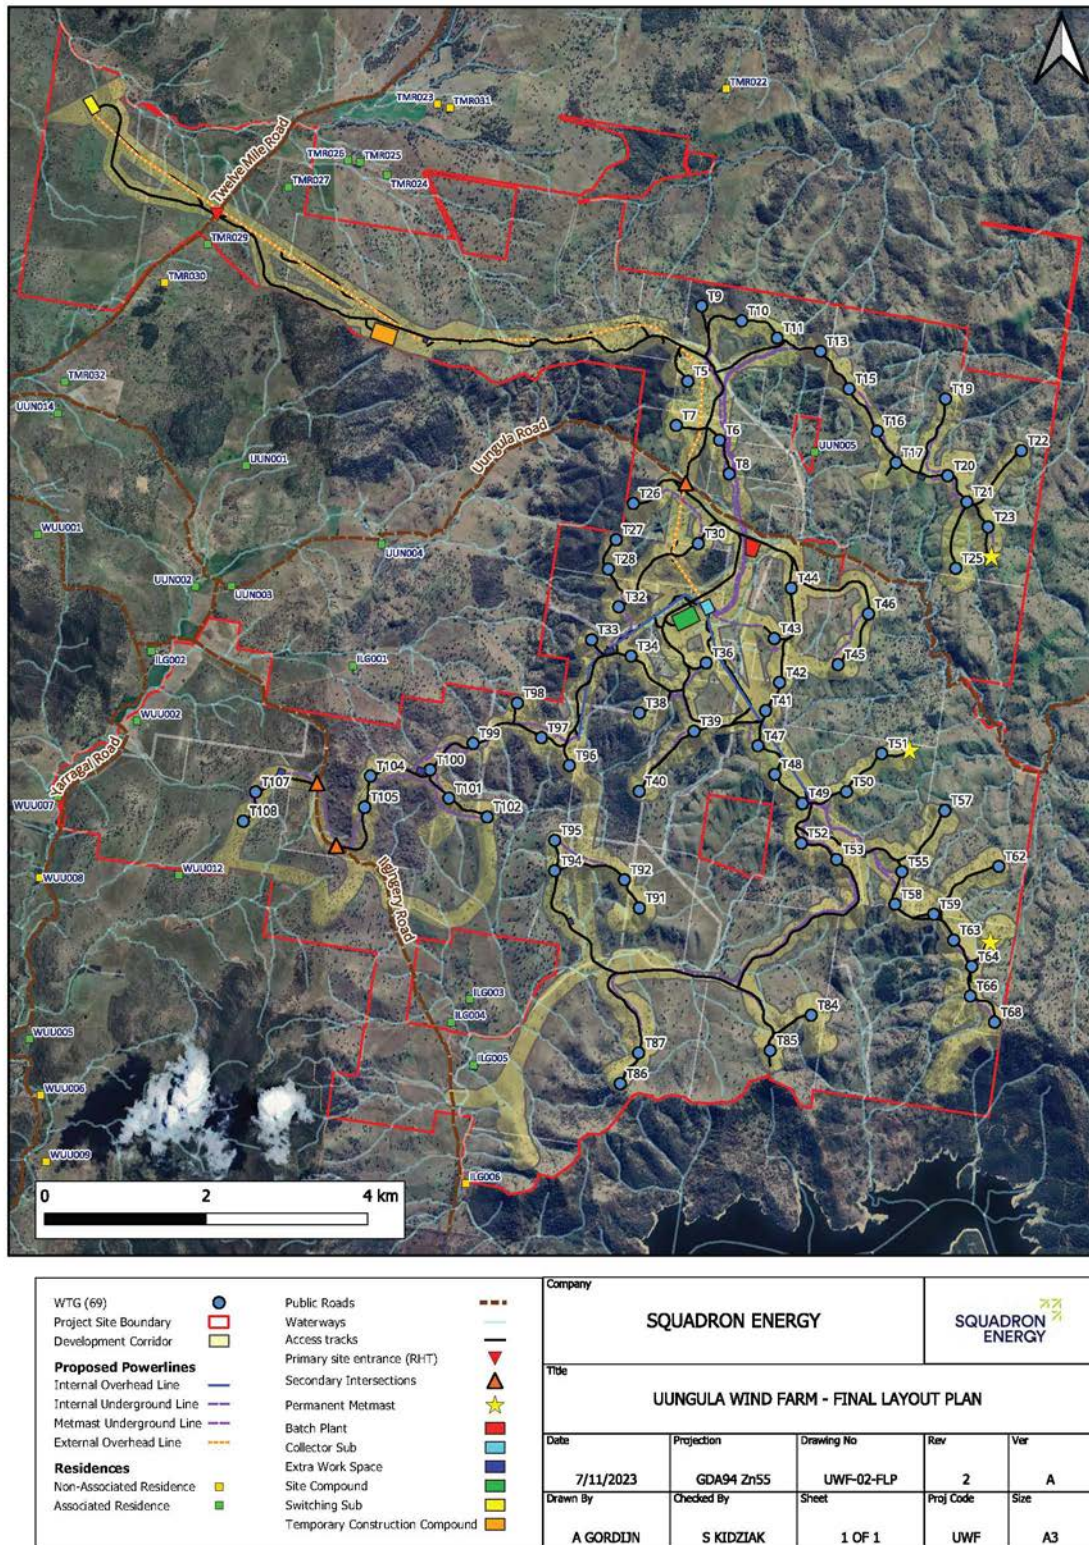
Project Location and Context (Source: UWF Final Layout Plan Rev 2, UWF NSW Planning Portal)
